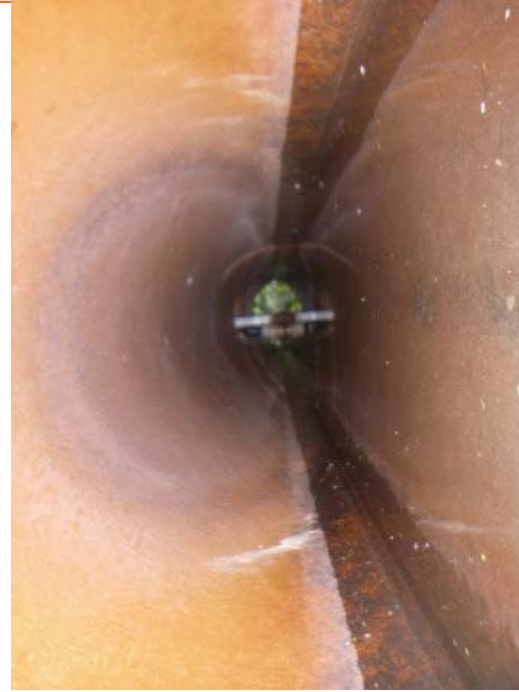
Outfall 001: 001-001 Pipe connections (south pipe)
